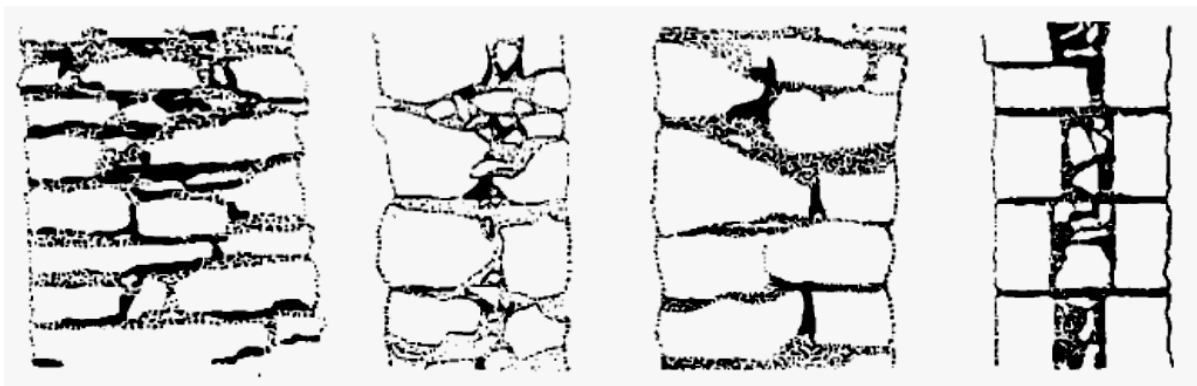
48- Typical masonry cross sections- single leaf; two leaves without connection; two leaves with connection; three leaves
